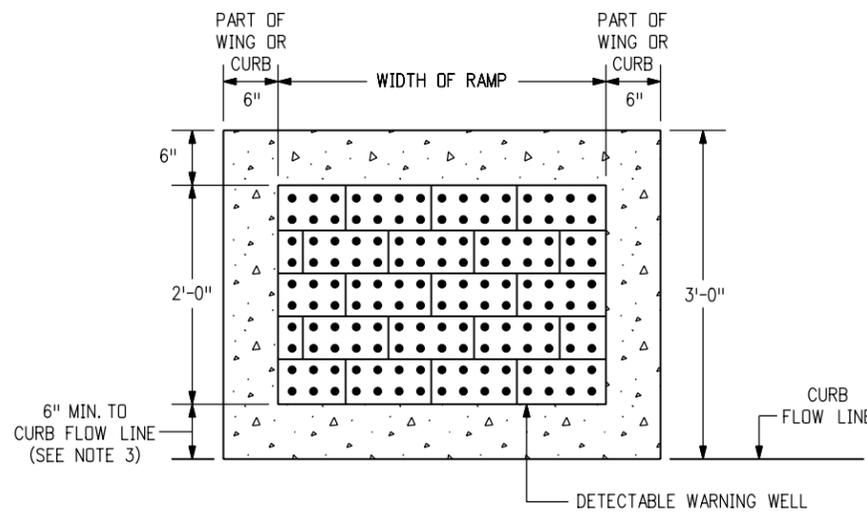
DETAIL FOR TYPES 1 AND 3 CURB RAMPS
